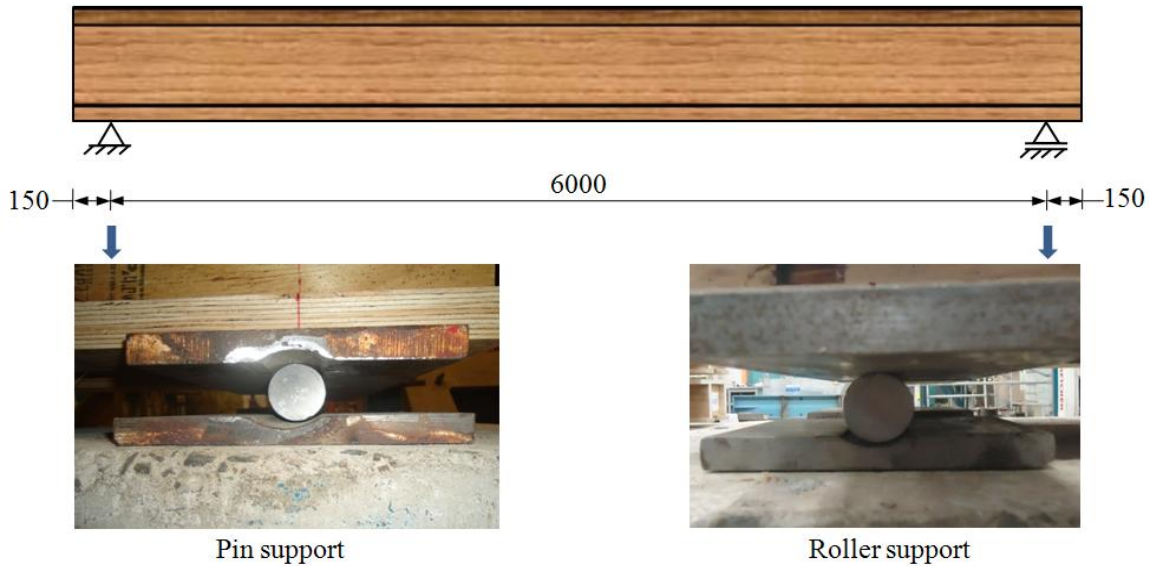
A schematic diagram of setup for 6 m span timber beam (mm).
